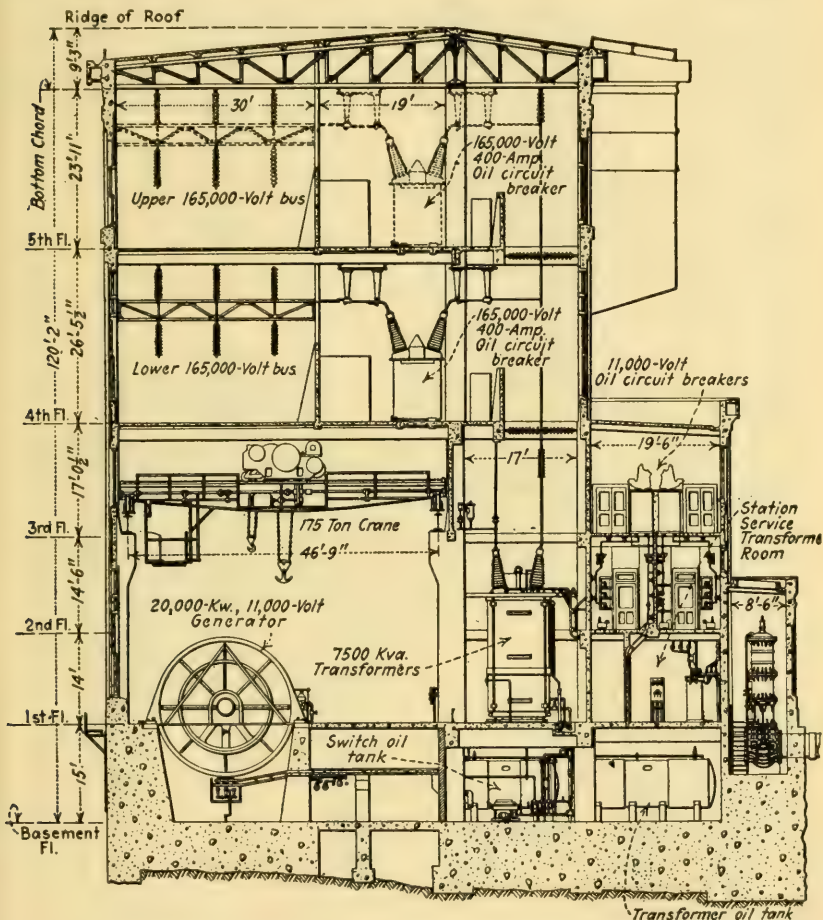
Sectional Elevation Caribou Power Station, Great Western Power Company. (For floor-plan, see Fig. 103A.)
